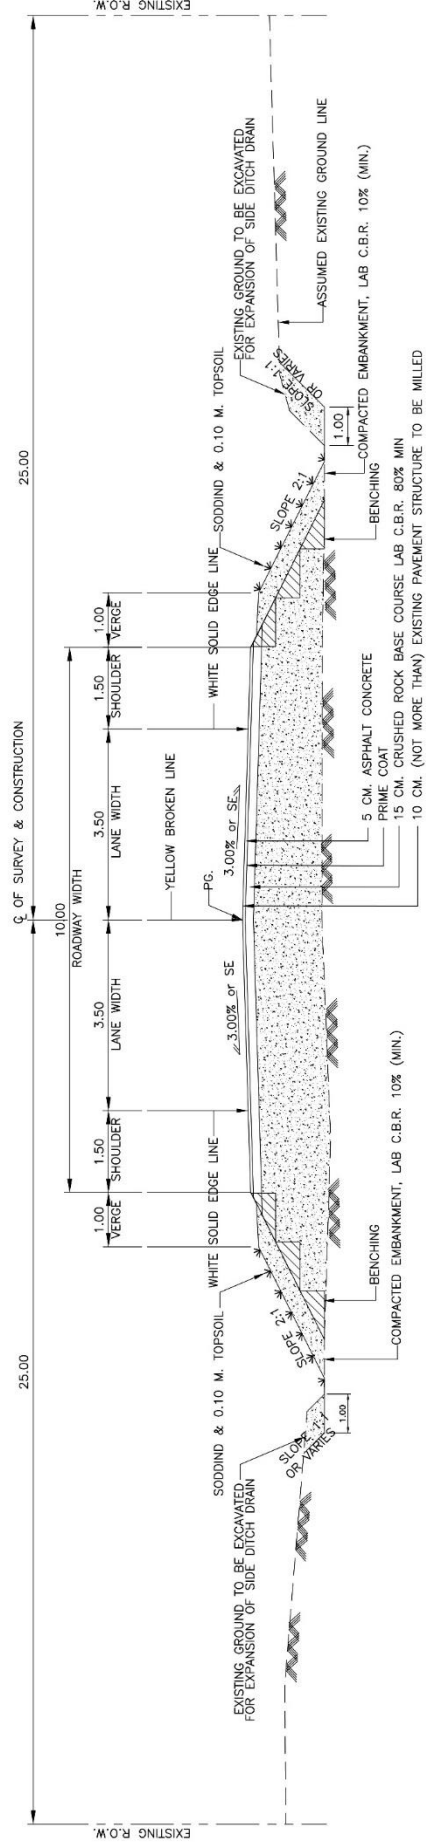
Typical Section of Sta. 0+150 – Sta. 28+800
